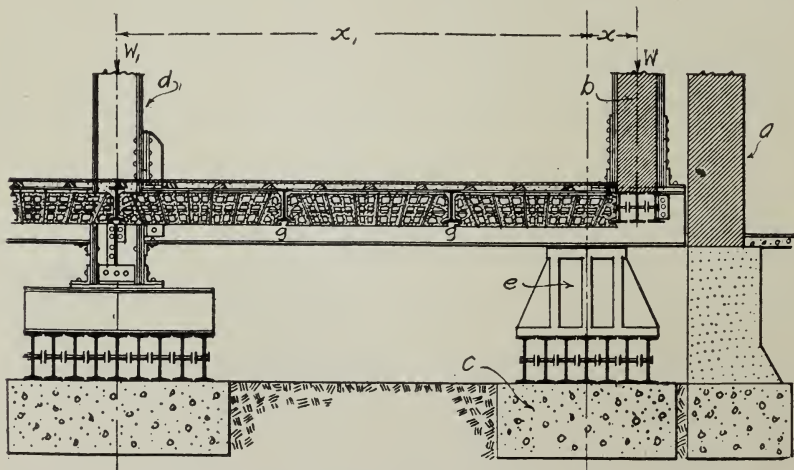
Examples of Cantilever Foundation Construction. Loss of Head-room.
